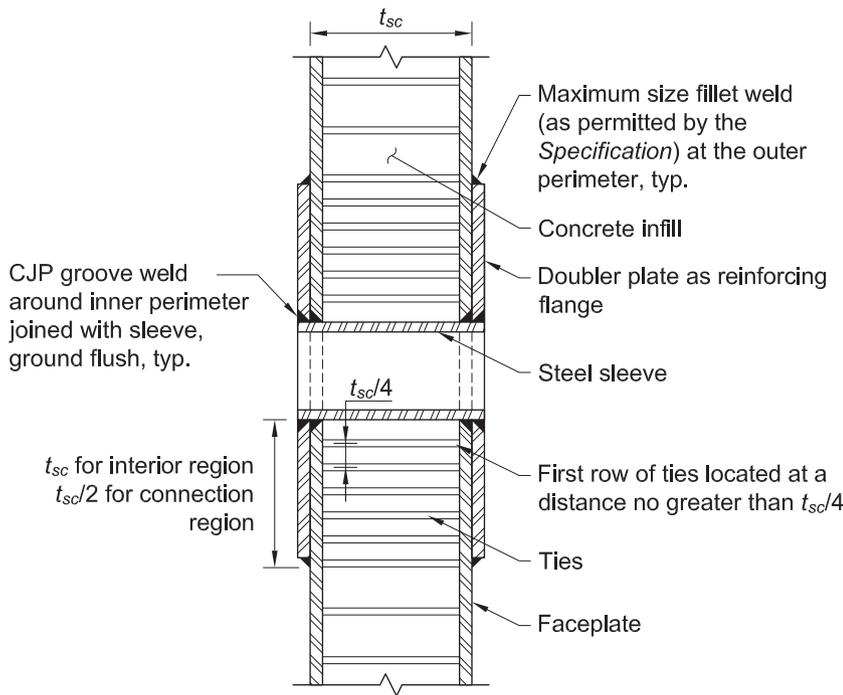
Detailing around openings using a doubler plate as reinforcing flange.
